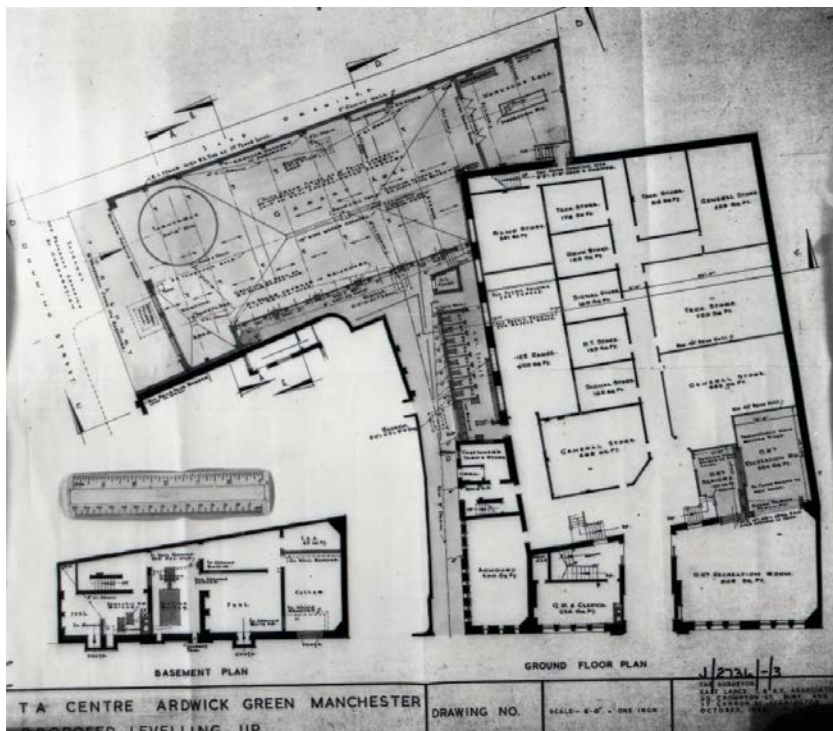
Reconstruction project of the building from 1956 – ground floor.
